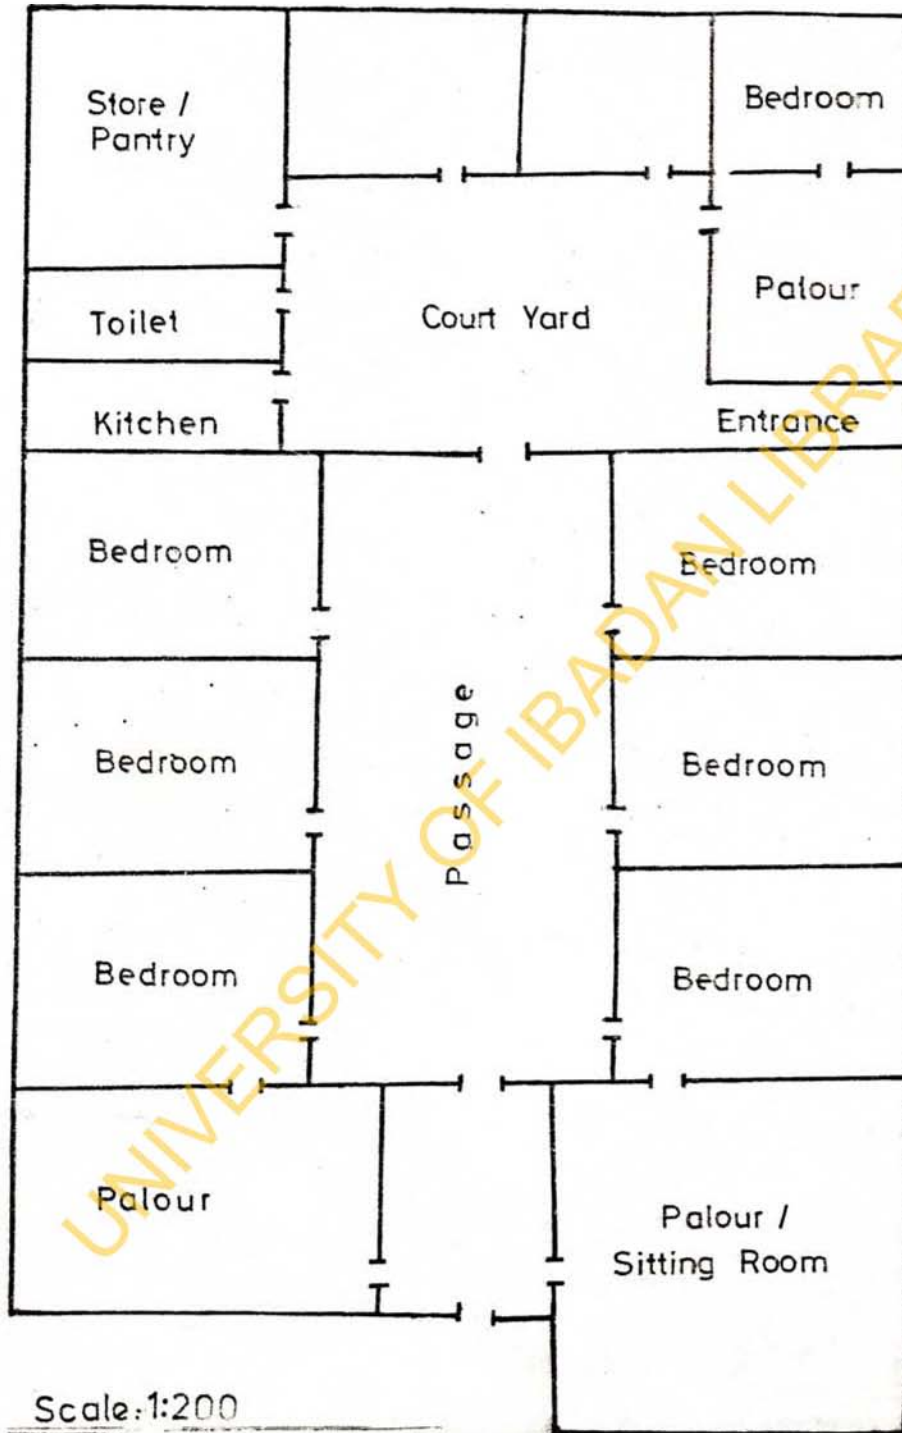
Plan of A Typical Commercial House in Towns and Cities of Oyo State
